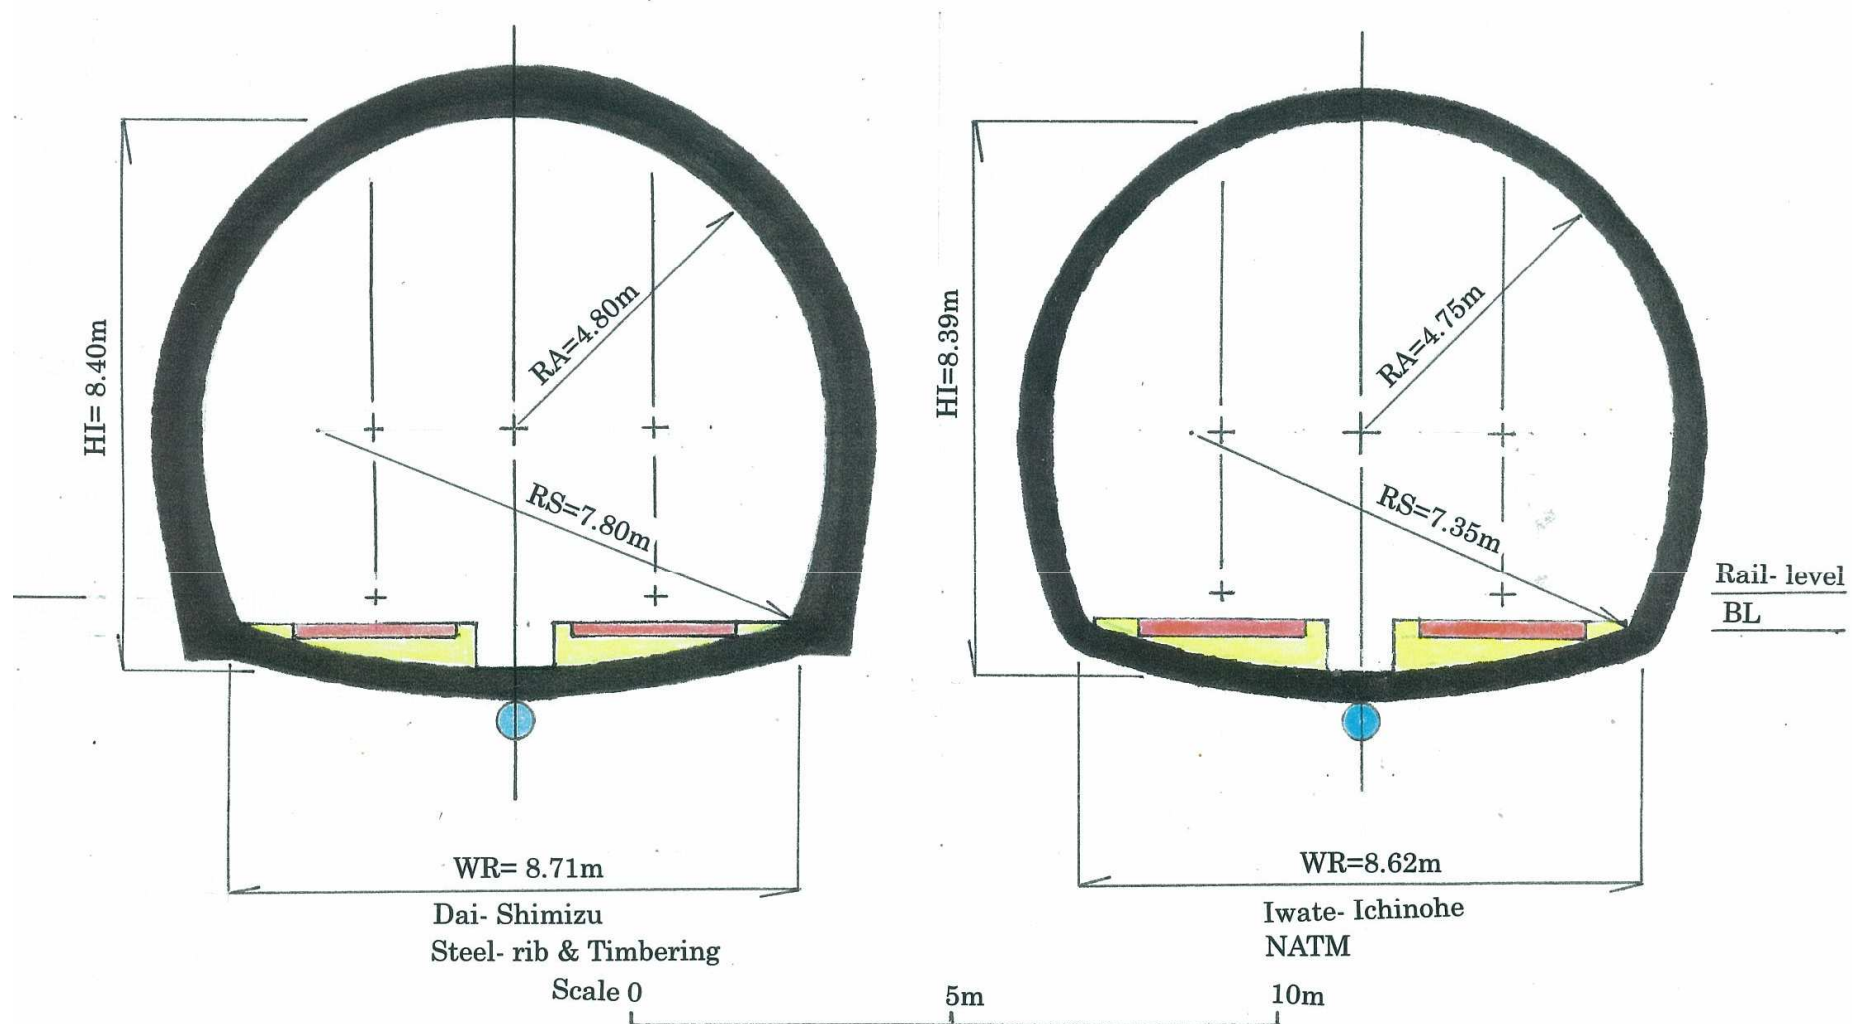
Typical Cross-section of Tunnels in Shinkansen. (constructed with conventional method; DB/ HC)
